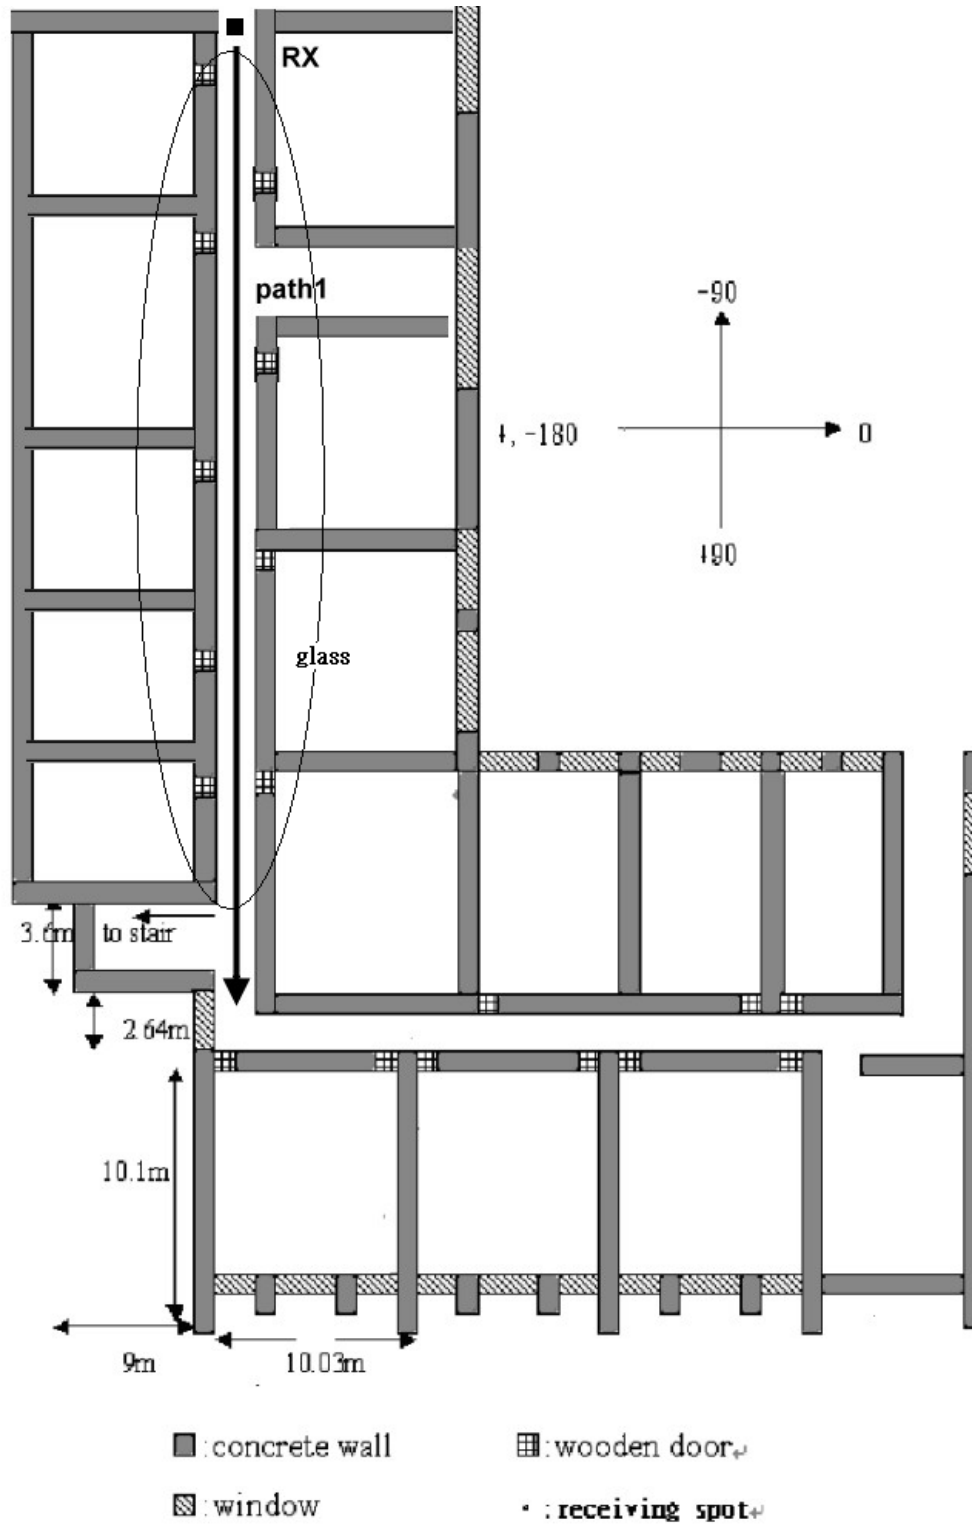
Floor layout of site C located on the second floor of Engineering Building No4
